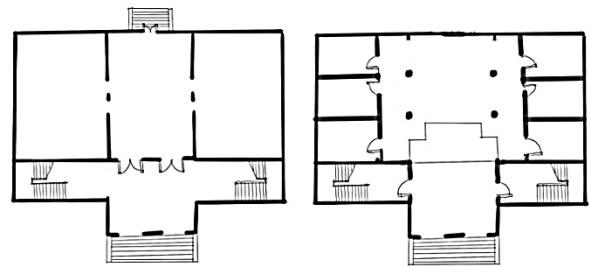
Left - the first floor plan of Yuparajwittayalai school; Right - the second floor plan [20]
